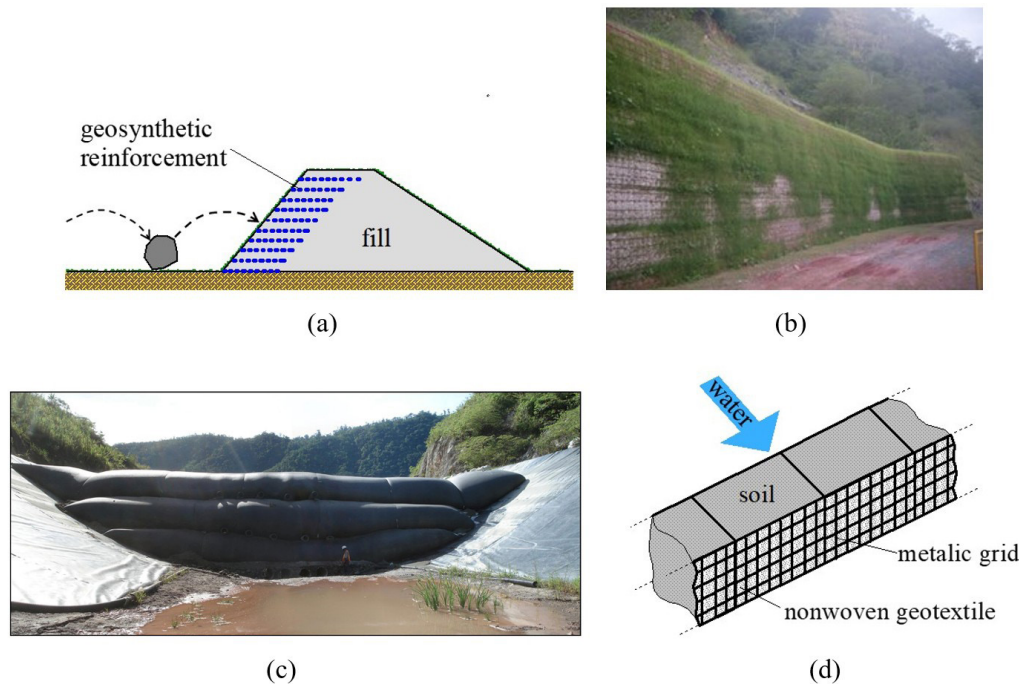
Different types of barriers incorporating geosynthetics: (a) schematic typical cross-section; (b) example of a rockfall barrier (courtesy Dr. P.M.F. Viana); (c) geomembrane tubes stack dam (IGS, 2010); (d) geotextile lined grid boxes for flood control.
